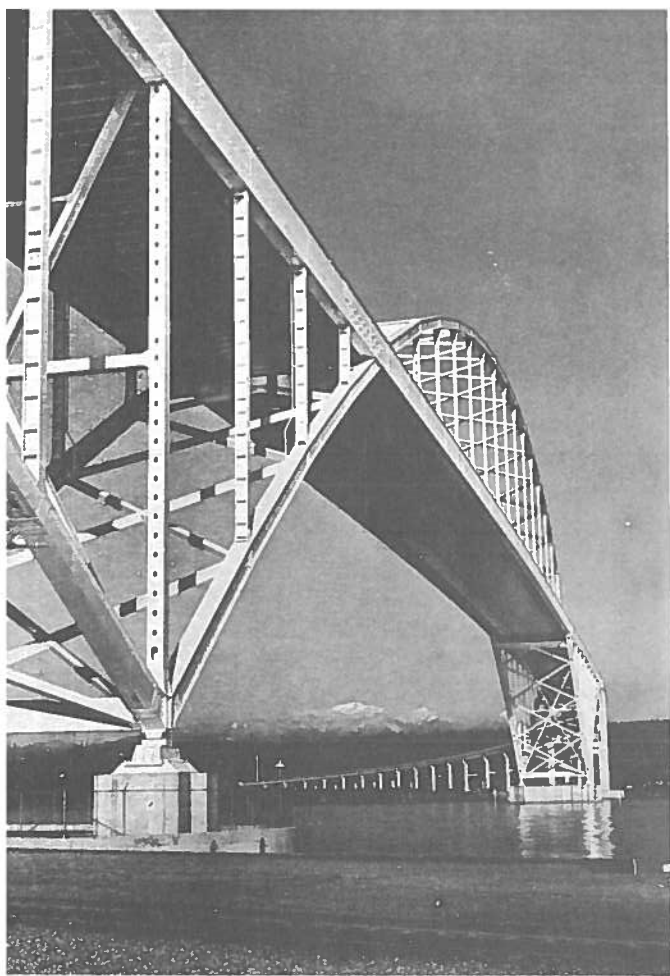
ORTHOTROPIC PLATE BRIDGE, CANADA (B.C.)
